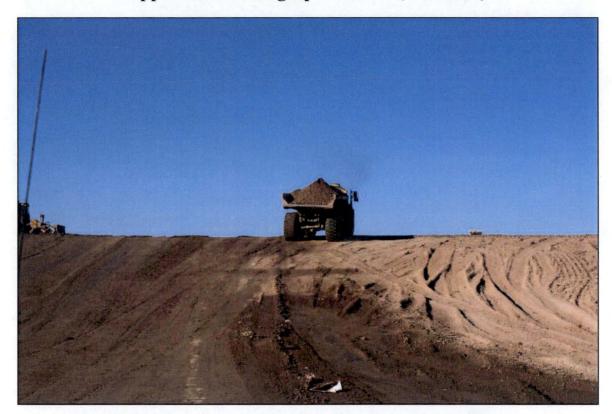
Haul Truck Hauling RRM to Lift Area December 2017
